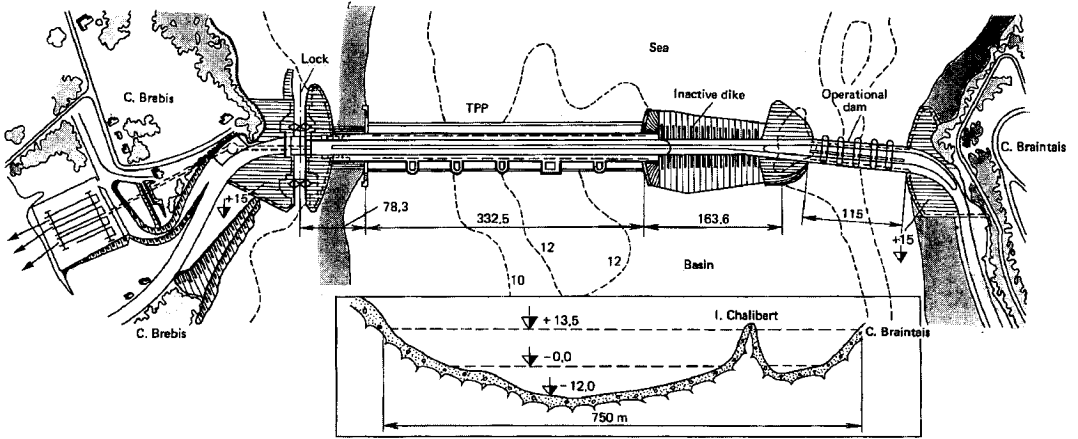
Bed profile of alignment and plan of the Rance TPP structures.
